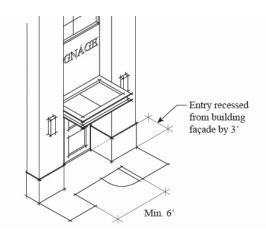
Entry recessed from street-facing building facade to create an alcove.
